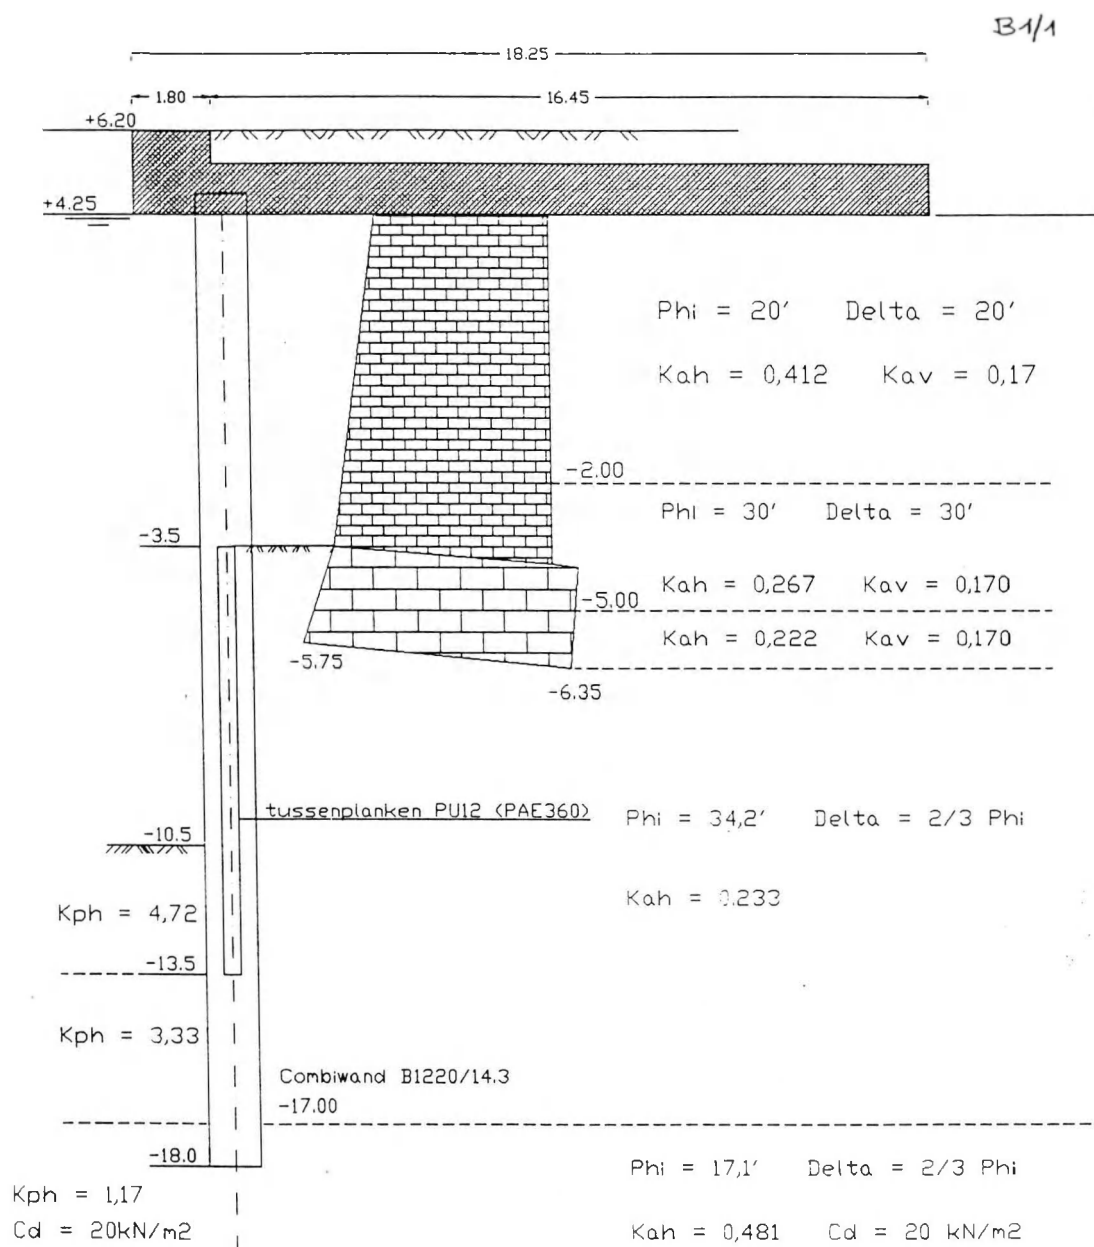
Calculation of quay wall with combiwall. Basic data.
